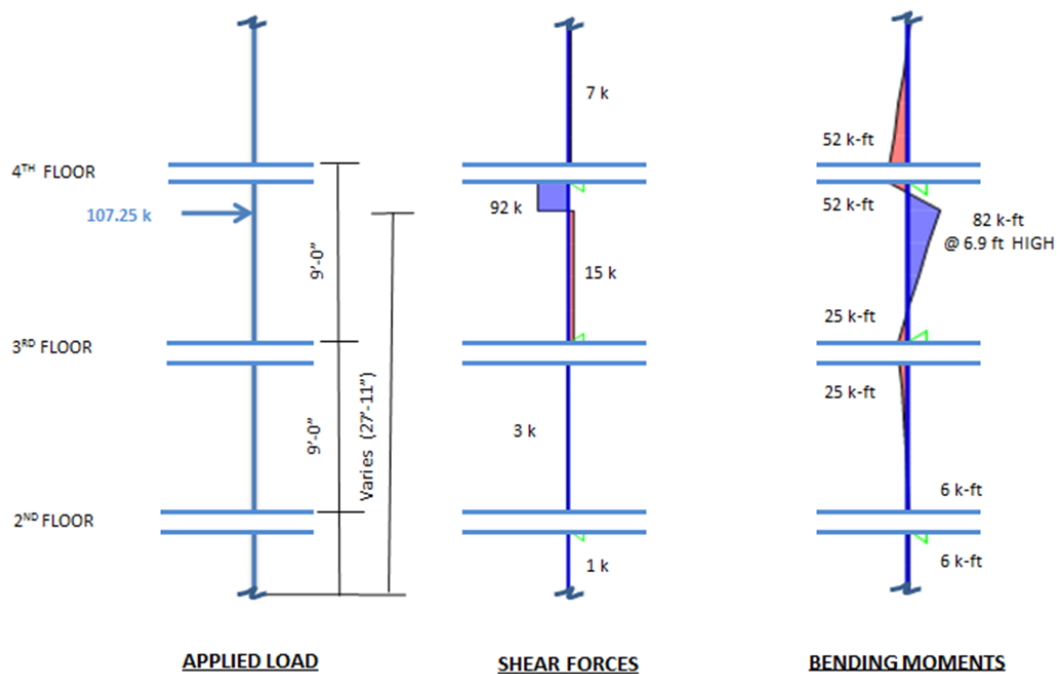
Impact load applied at "d" away from the end of column on the 3rd floor
